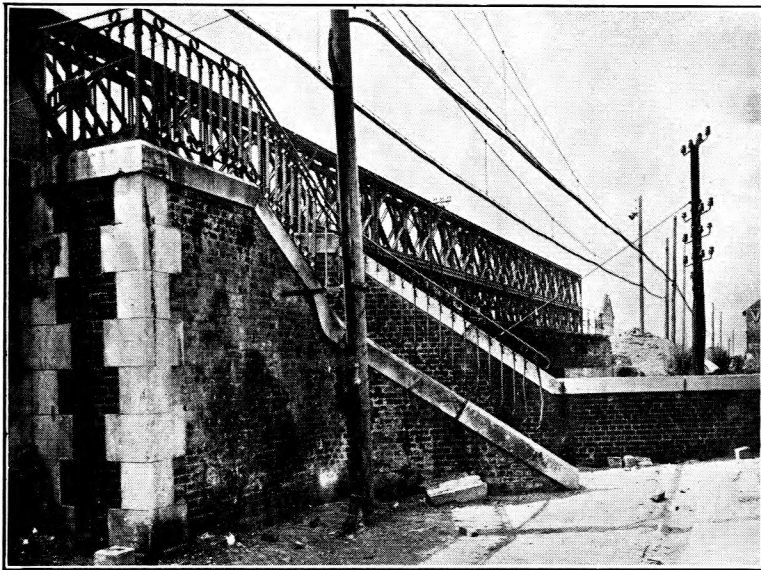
AERIAL SECTION OF BALANCED PAIR CABLE BY BAILEY BRIDGE OVER RAILWAY AT CALAIS.
